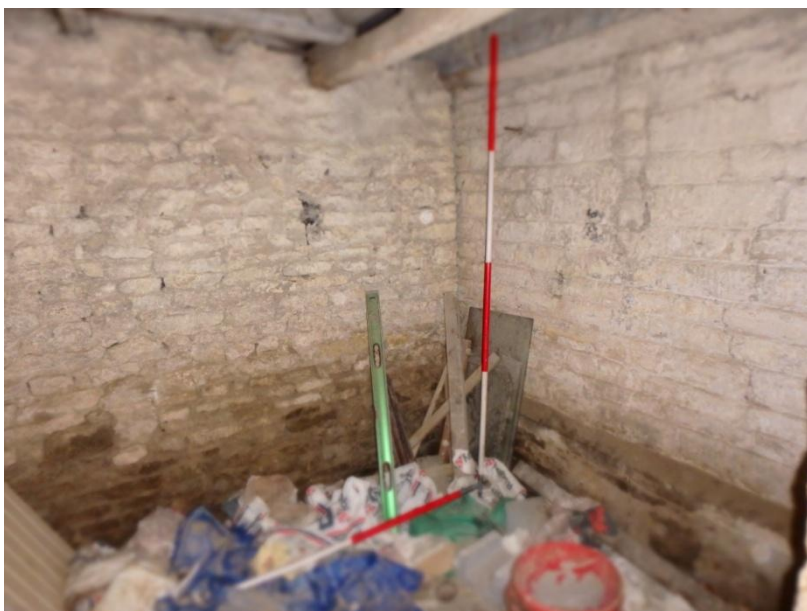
and 122 provide images of the south wall of Room C. This wall has been rendered over probably with plasterwork or cement and has been subsequently whitewashed over which has obscured the underlying detail of the wall fabric. The wall is bisected by a modern timber stall which is constructed of a timber frame onto which is attached a sheet of hardboard. The timber frame is in turn attached to a rafter and to one of the tie beams.
